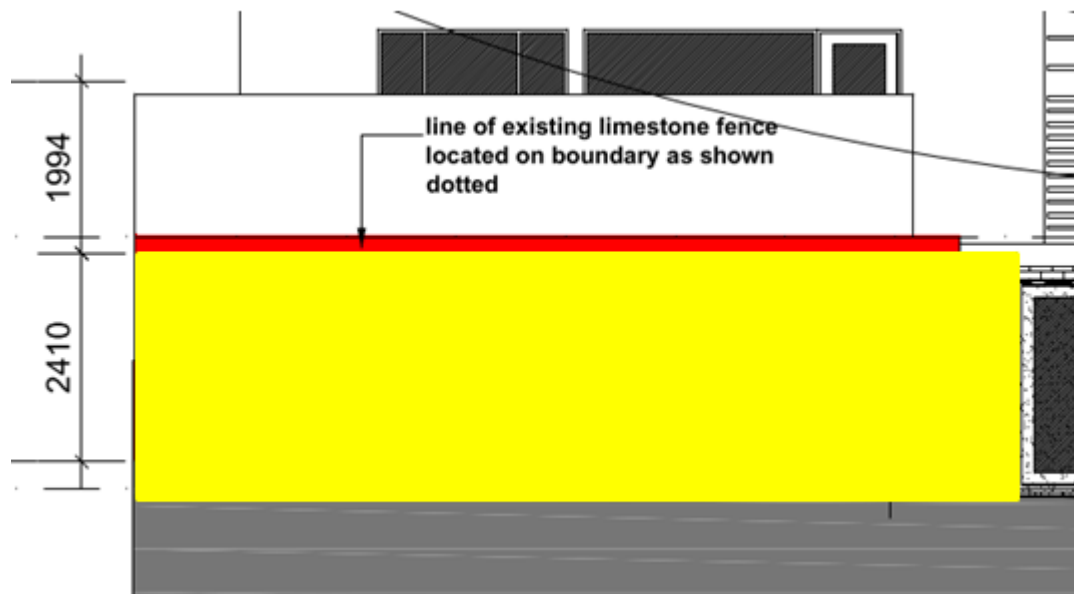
Yellow shows existing boundary fence, red shows proposed boundary wall
